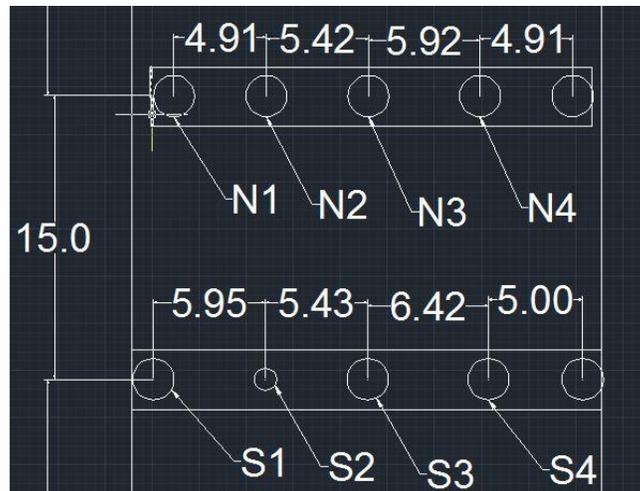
Plan View of Grant County Bridge Piles (with dimensions)
